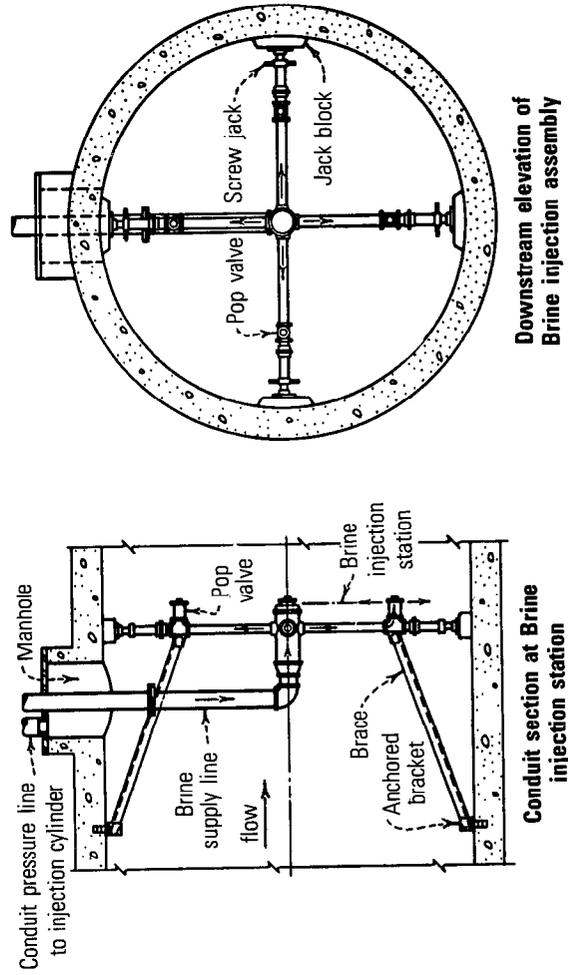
Brine injection equipment in conduit. (Courtesy of U.S. Bureau of Reclamation.)
